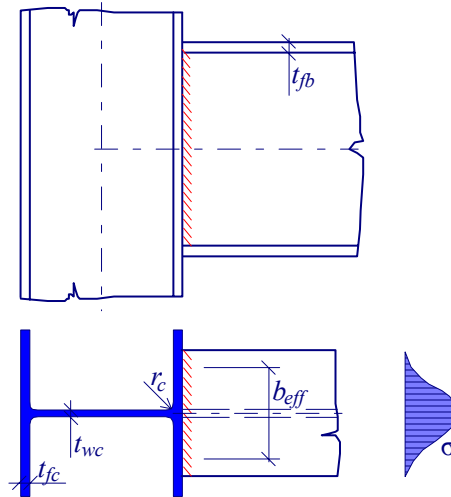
Effective width of beam flange of welded joint and stress in the connected flange
